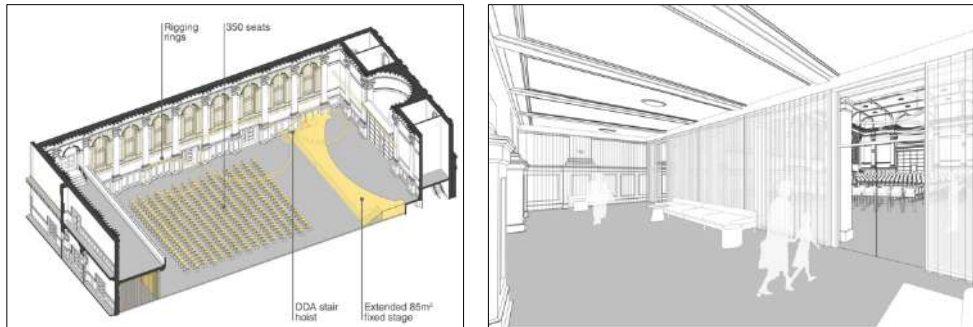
(left) Axonometric showing the proposed retractable platforms abutting the existing stage (which is retained with its semi-circular form remaining legible).
